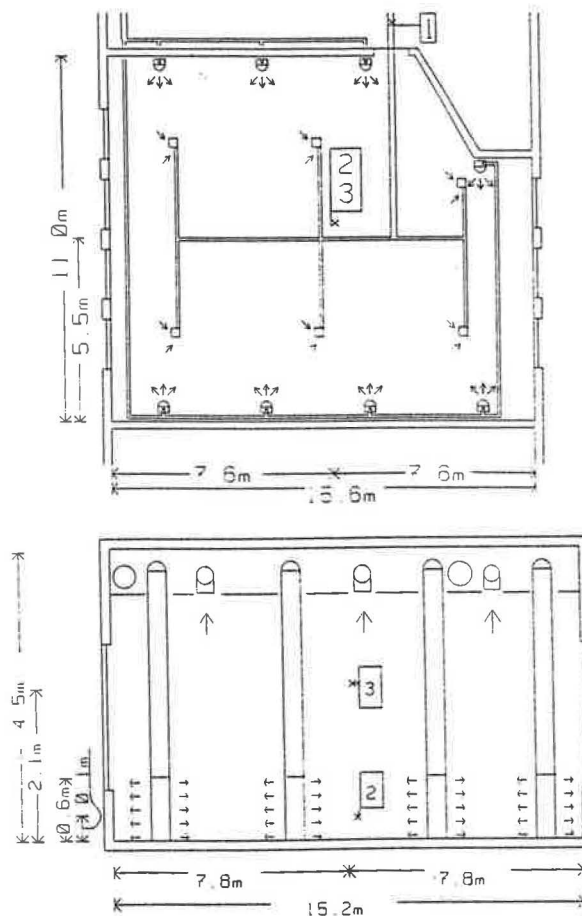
The layout and a cross section of the lecture hall (not drawn to scale).
